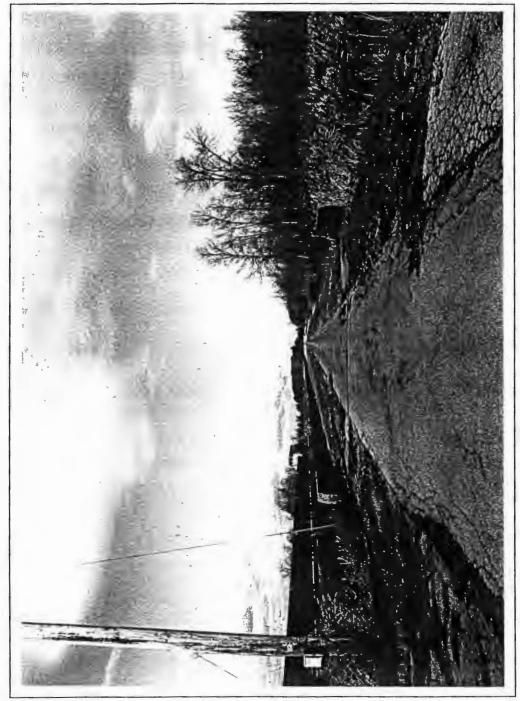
Culvert at West Patrol Road north of Indian Creek Road, facing north. Seneca Army Depot Activities, Seneca County, NY.
